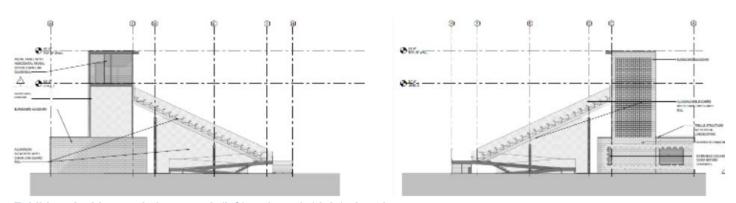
Architectural plans, north (left) and south (right) elevations.
